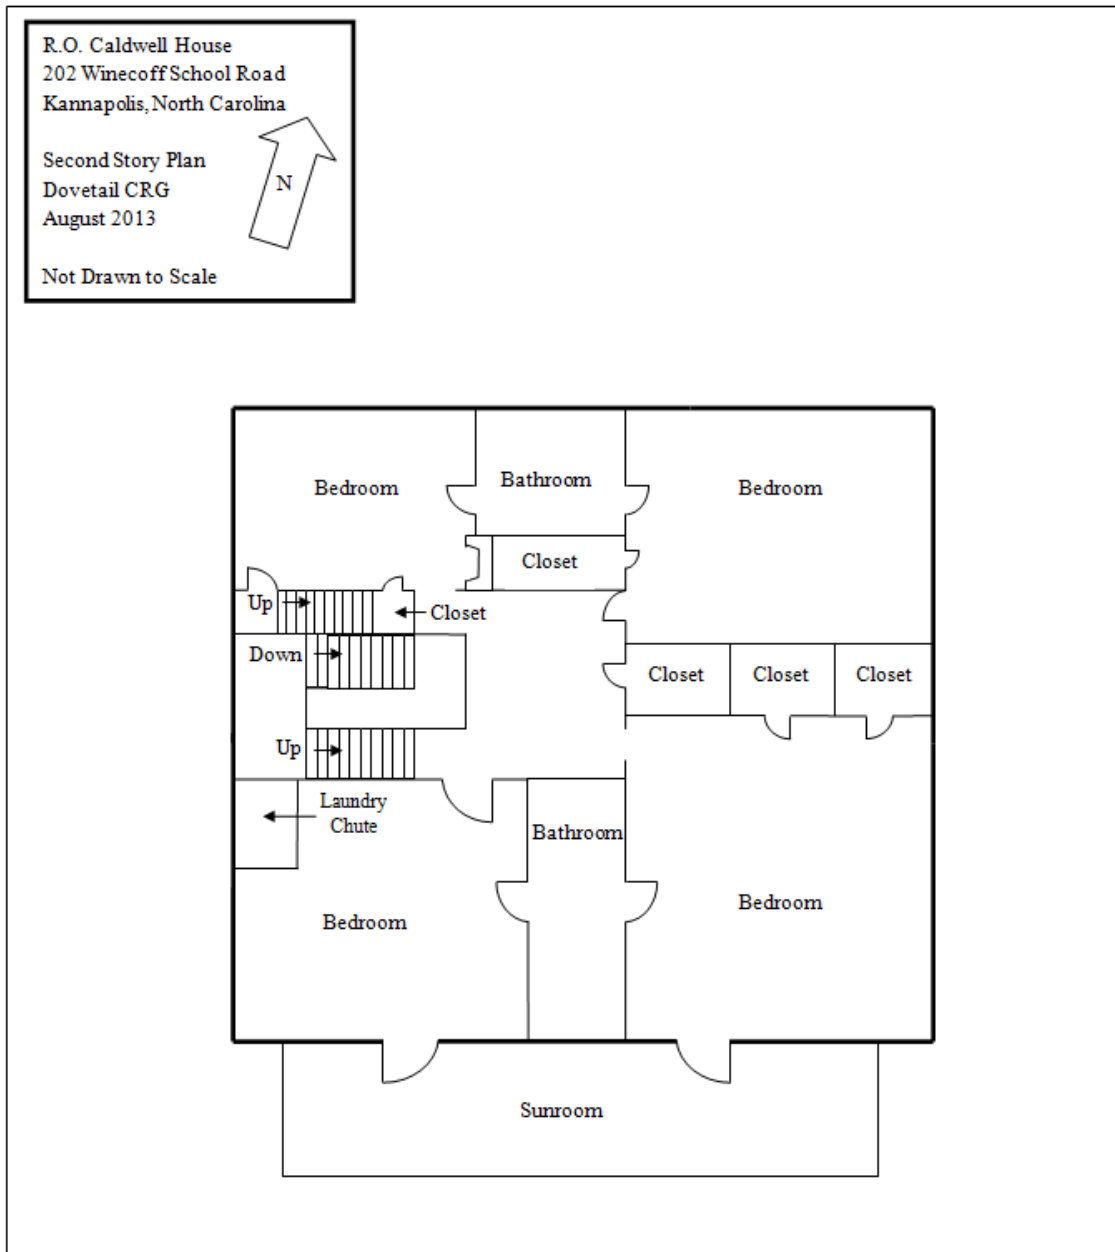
Second Story Plan of the R.O. Caldwell House (CA 423).
